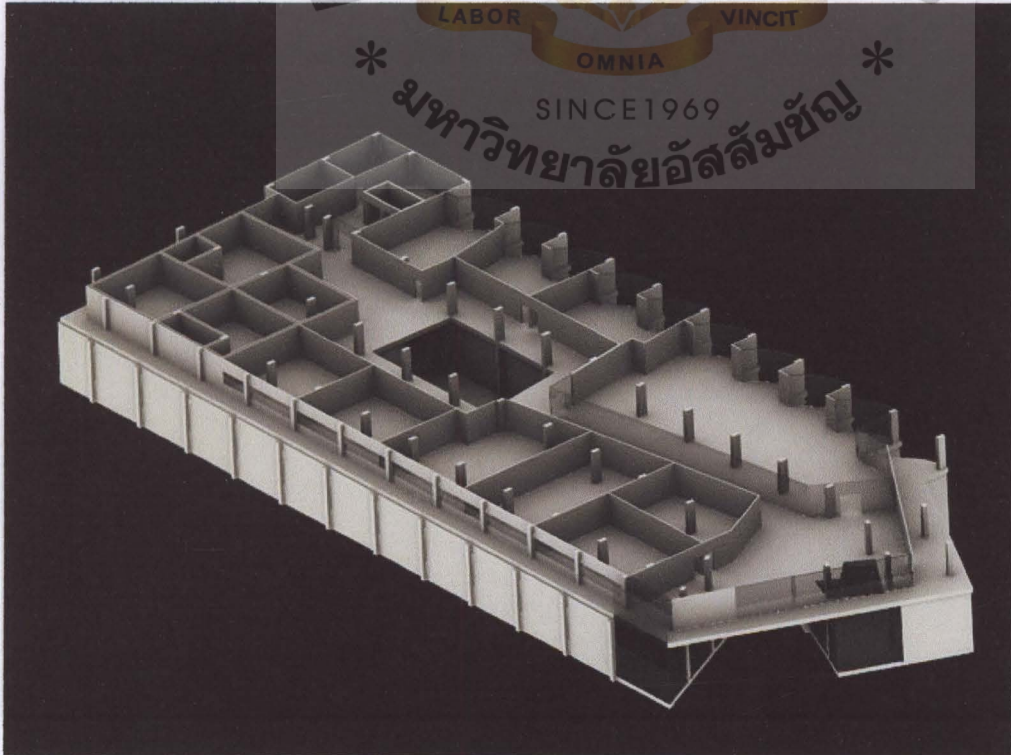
Space Model 2<sup>nd</sup> Floor
